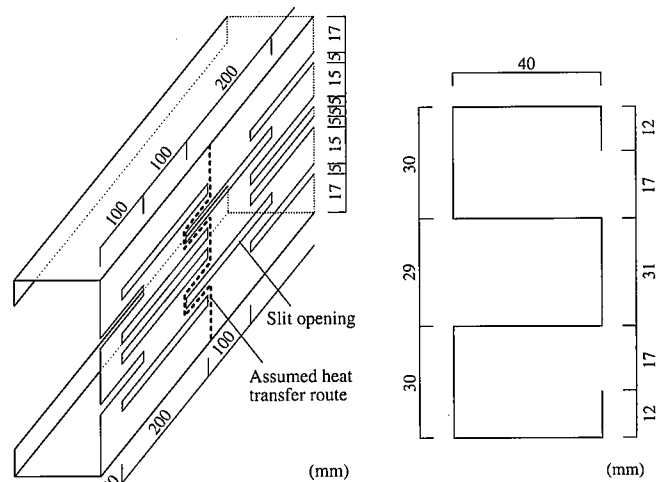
Schematic of C-shaped steel stud with slits in web Fig. 6 Cross section of Σ-shaped steel stud
